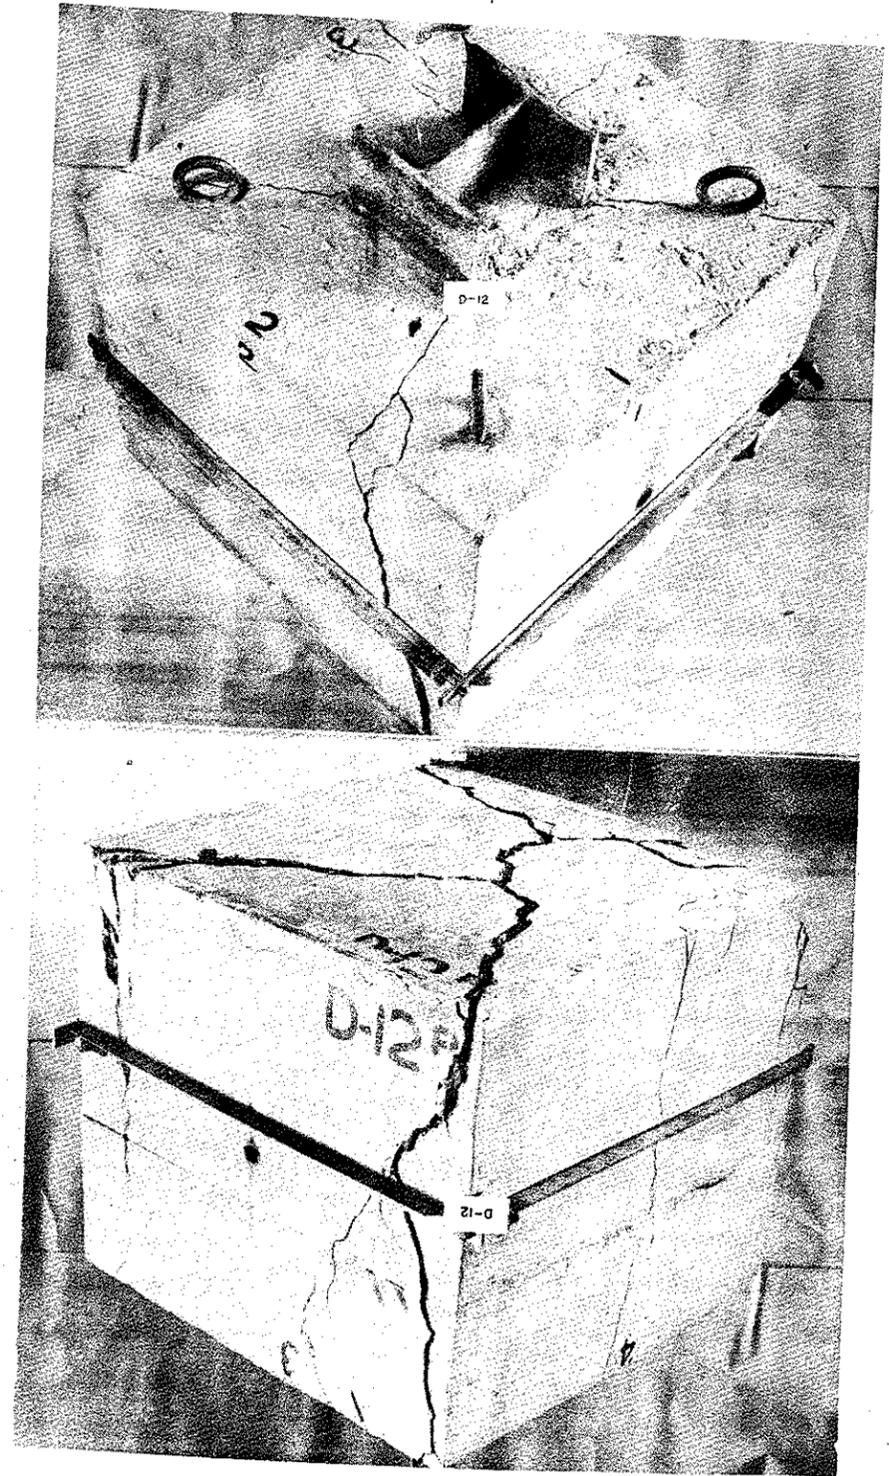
APPEARANCE OF SPECIMEN D-12 AFTER TESTING.
